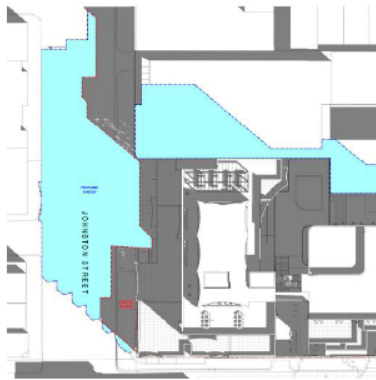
overshadowing at 10am (overshadows southern footpath on Johnston Street)
